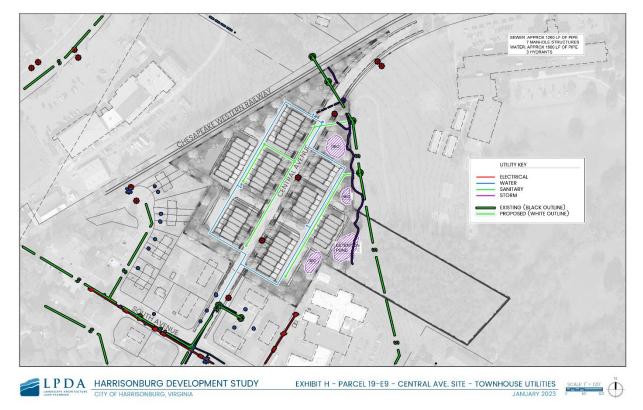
Exhibit H: Central Avenue townhouse SWM/Utility concept plan
